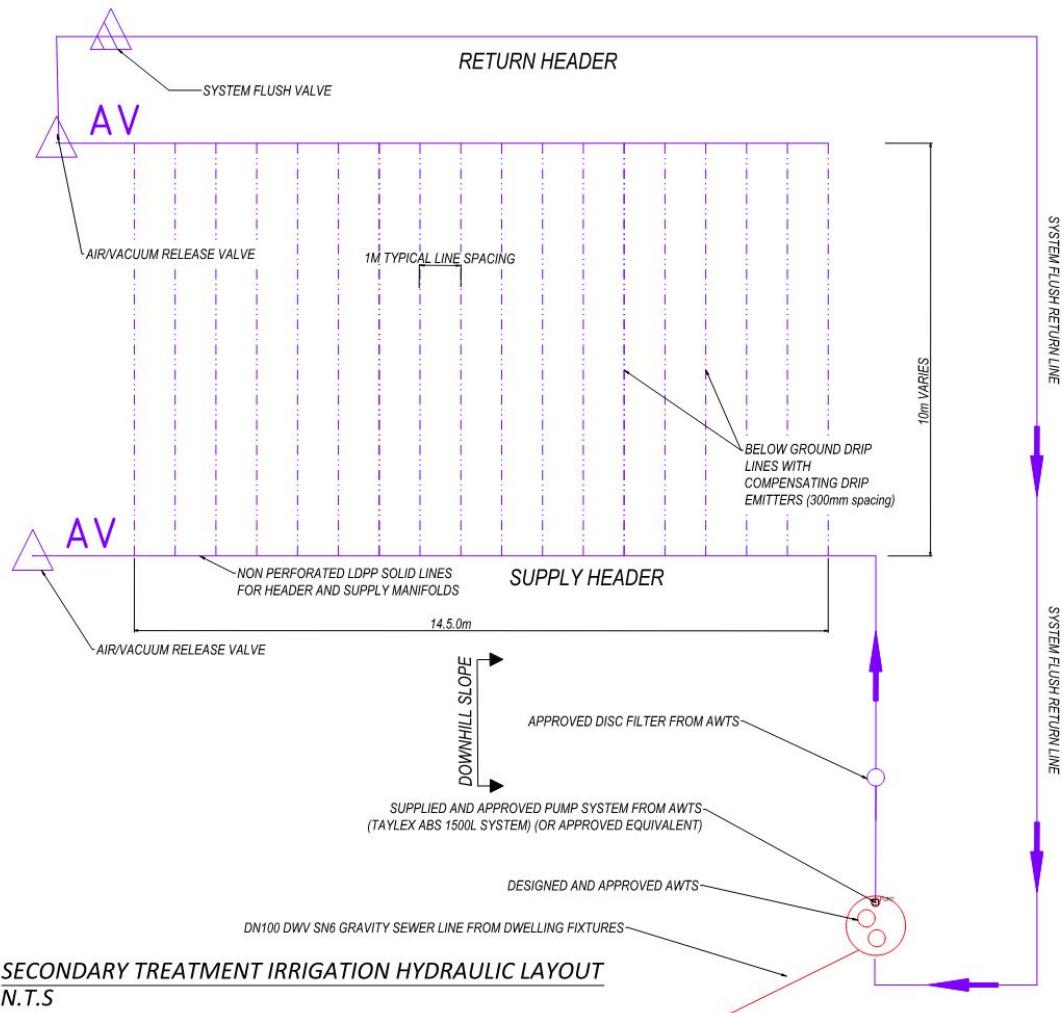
PROPOSED WASTEWATER IRRIGATION LAYOUT
